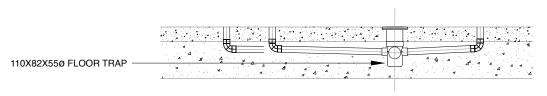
DETAIL B Floor gullies should connect direct to a stack or as Detail C.
